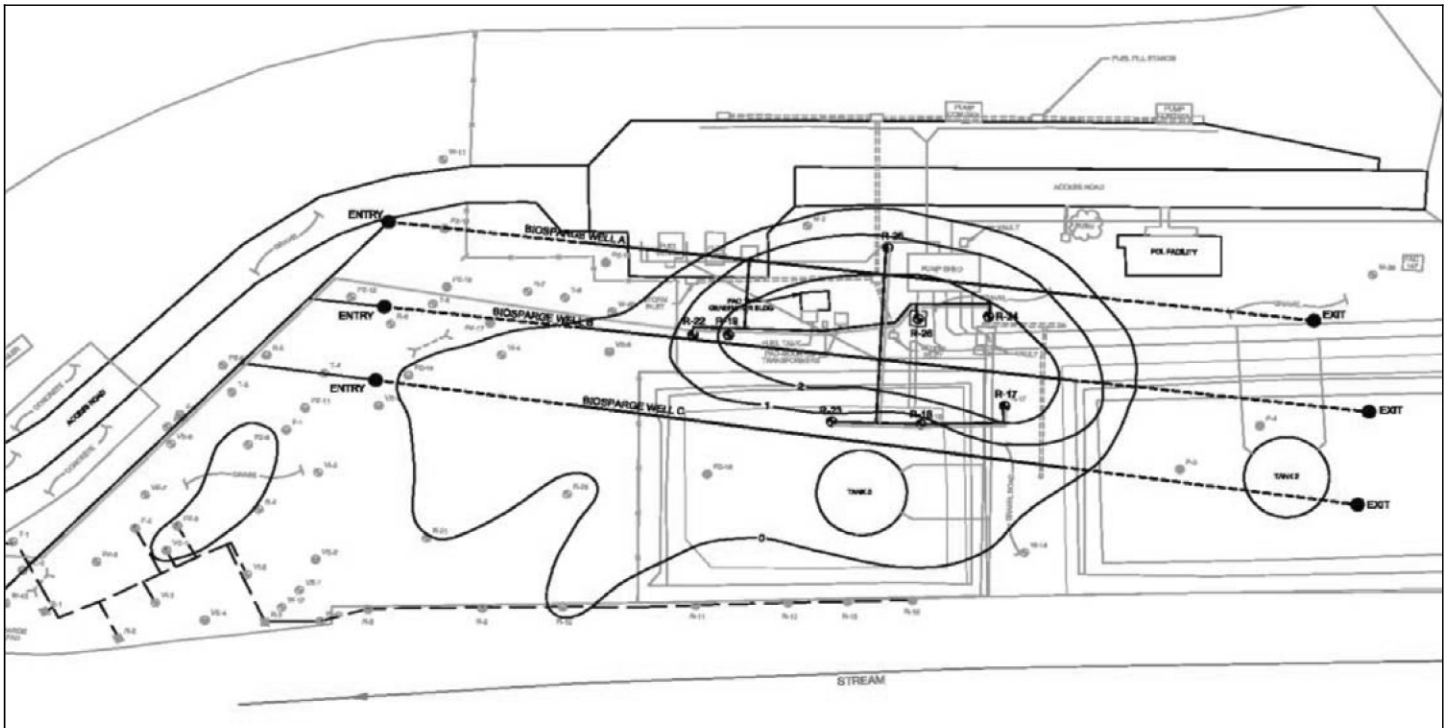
Layout of HDD wells and vertical SVE wells at Site SS-26.
